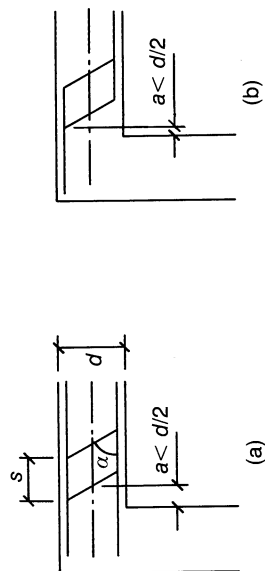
Recommended spacing of shear reinforcement: (a) stirrups;
